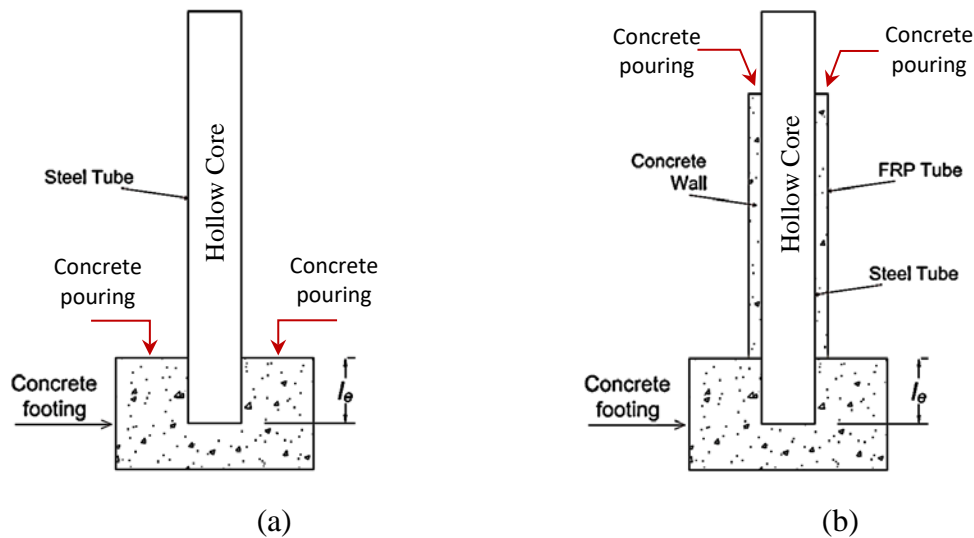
General arrangement of the construction of the HC-FCS column (a) inserting the steel tube and casting the footing, (b) installing the FRP tube and pouring the concrete shell.
